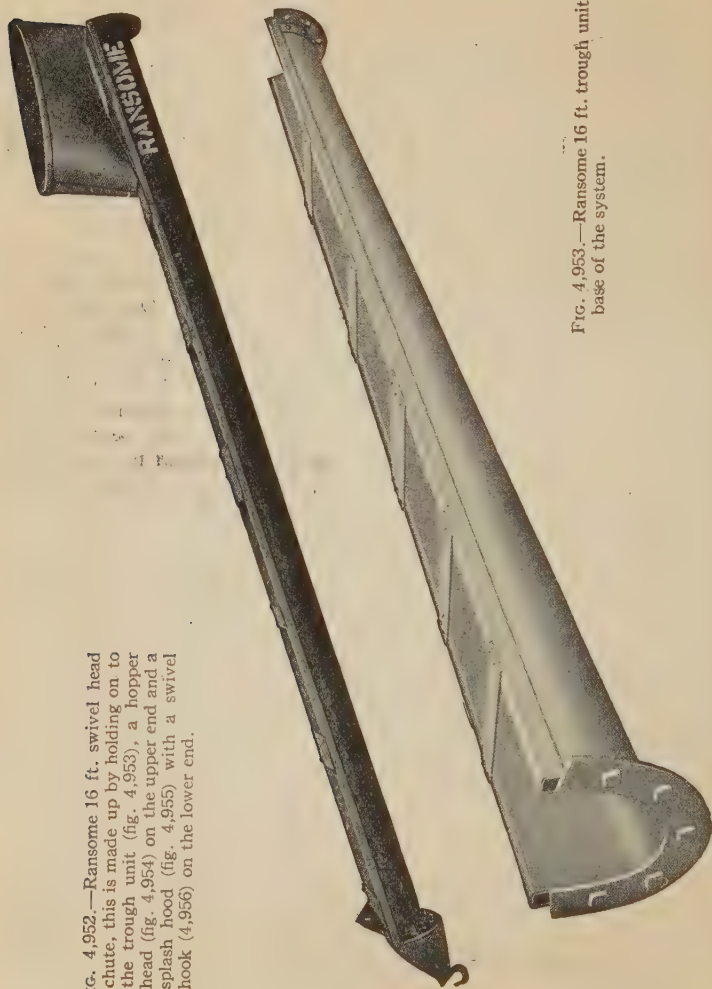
,952.—Ransome 16 ft. swivel head chute, this is made up by holding on to the trough unit (fig. 4,953), a hopper head (fig. 4,954) on the upper end and a splash hood (fig. 4,955) with a swivel hook (4,956) on the lower end.
